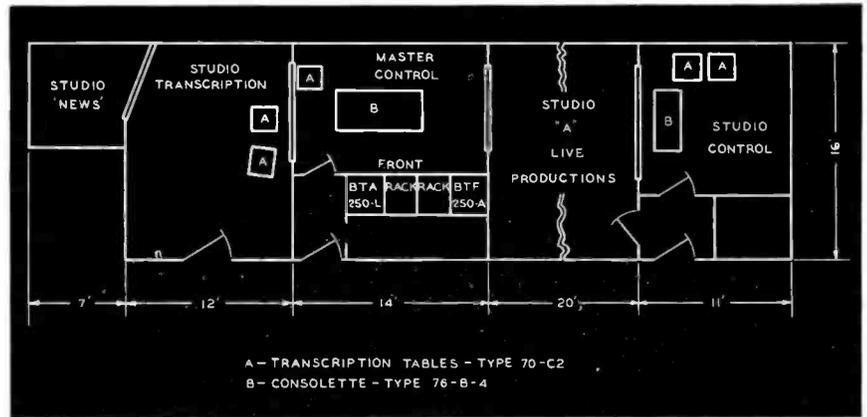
(above). The WSRS single-floor station plan showing transmitter room and studio layout.
